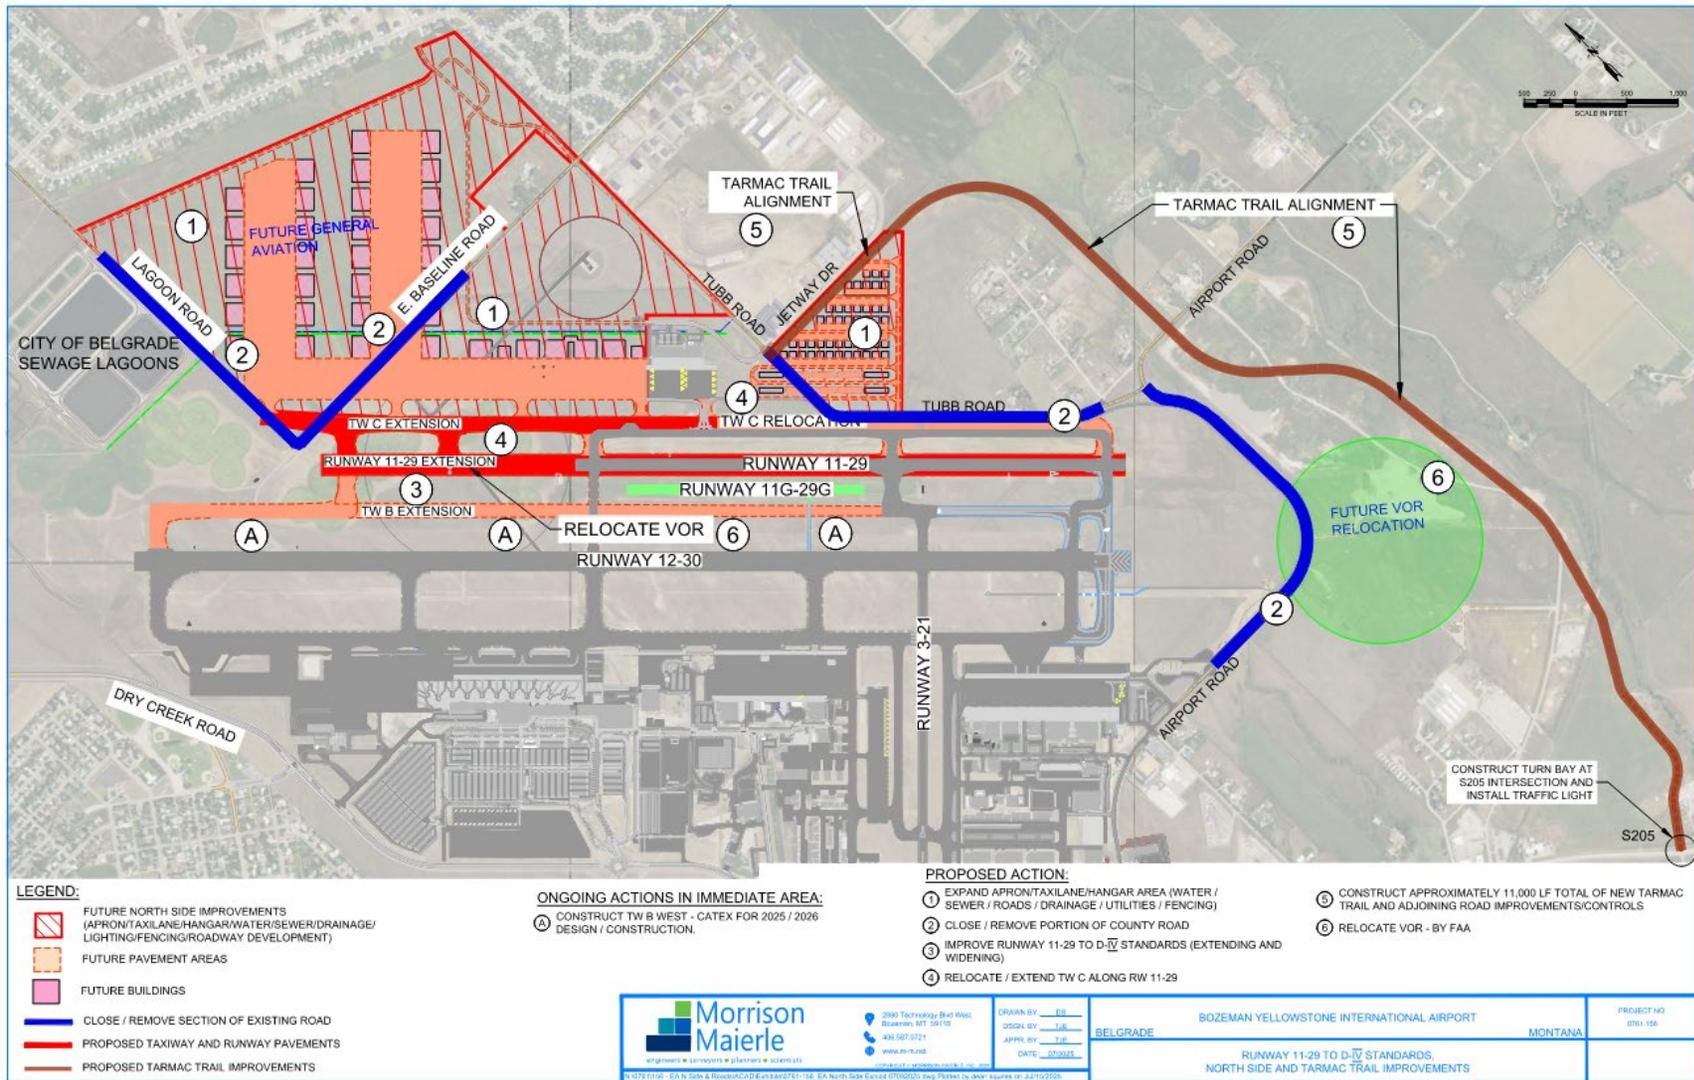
Runway 11-29 Extension, Widening, and Taxiway Improvements
